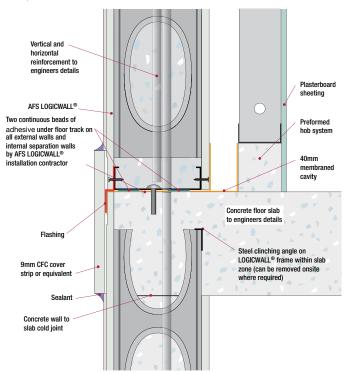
Cavity Wall with Hob Detail - Flat Slab
